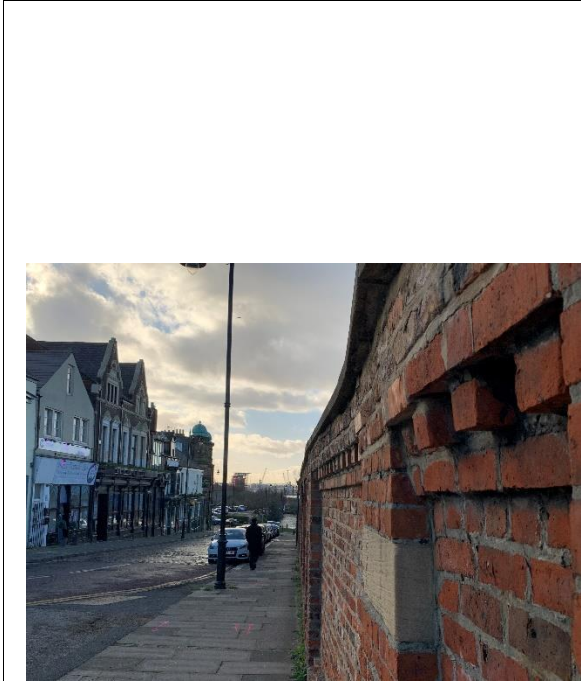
Wall Section 4, top section of wall has been re-built with brickwork to try and match original brick.
